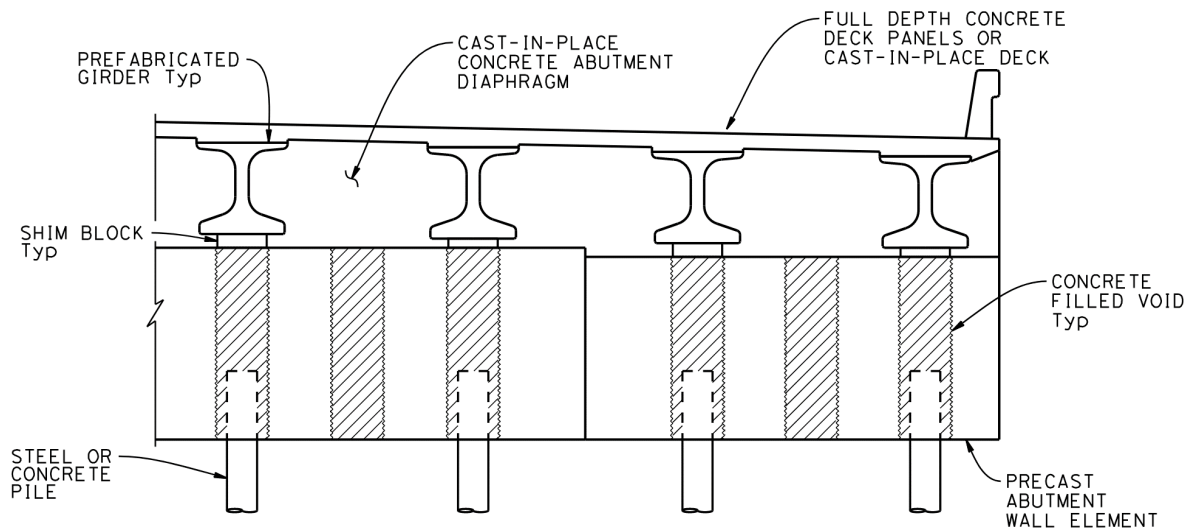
Integral Abutment with Precast Abutment Wall Elements
